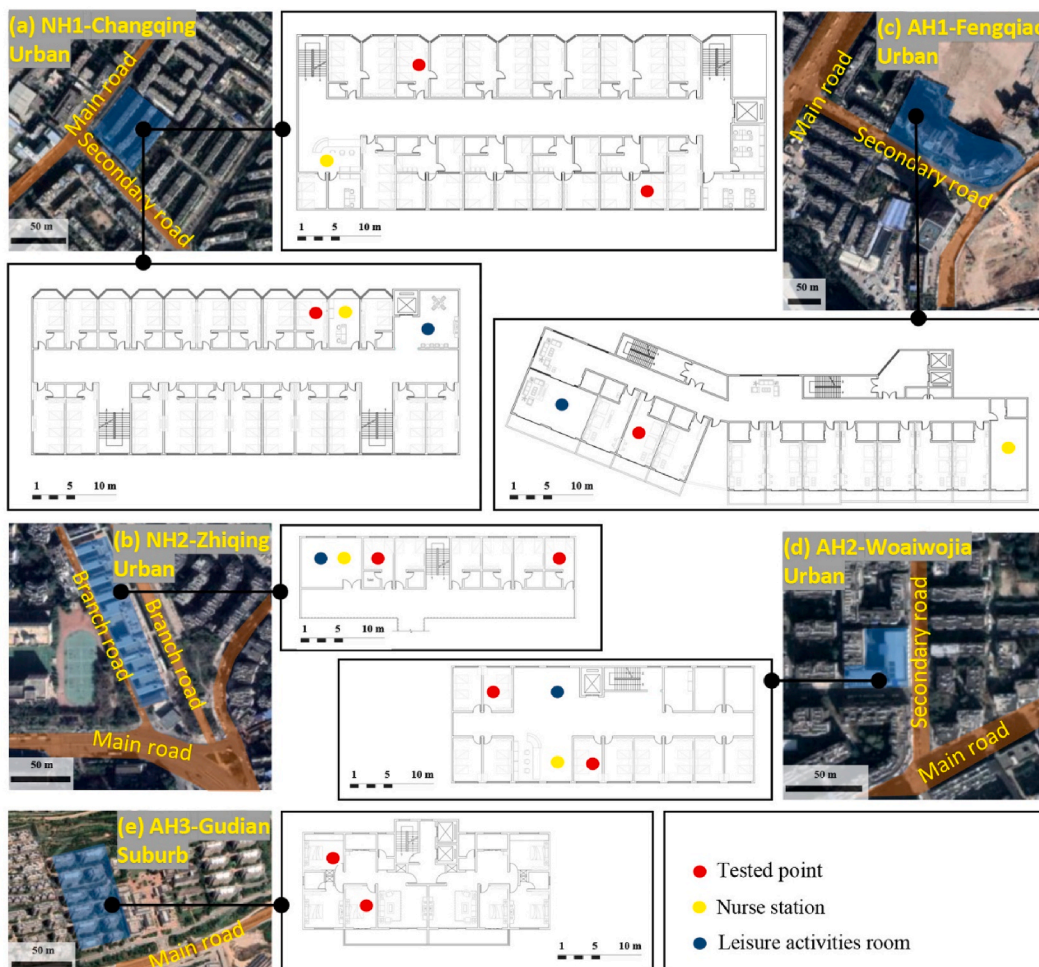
Site locations, corresponding floor plans and acoustic test points used in the study.
